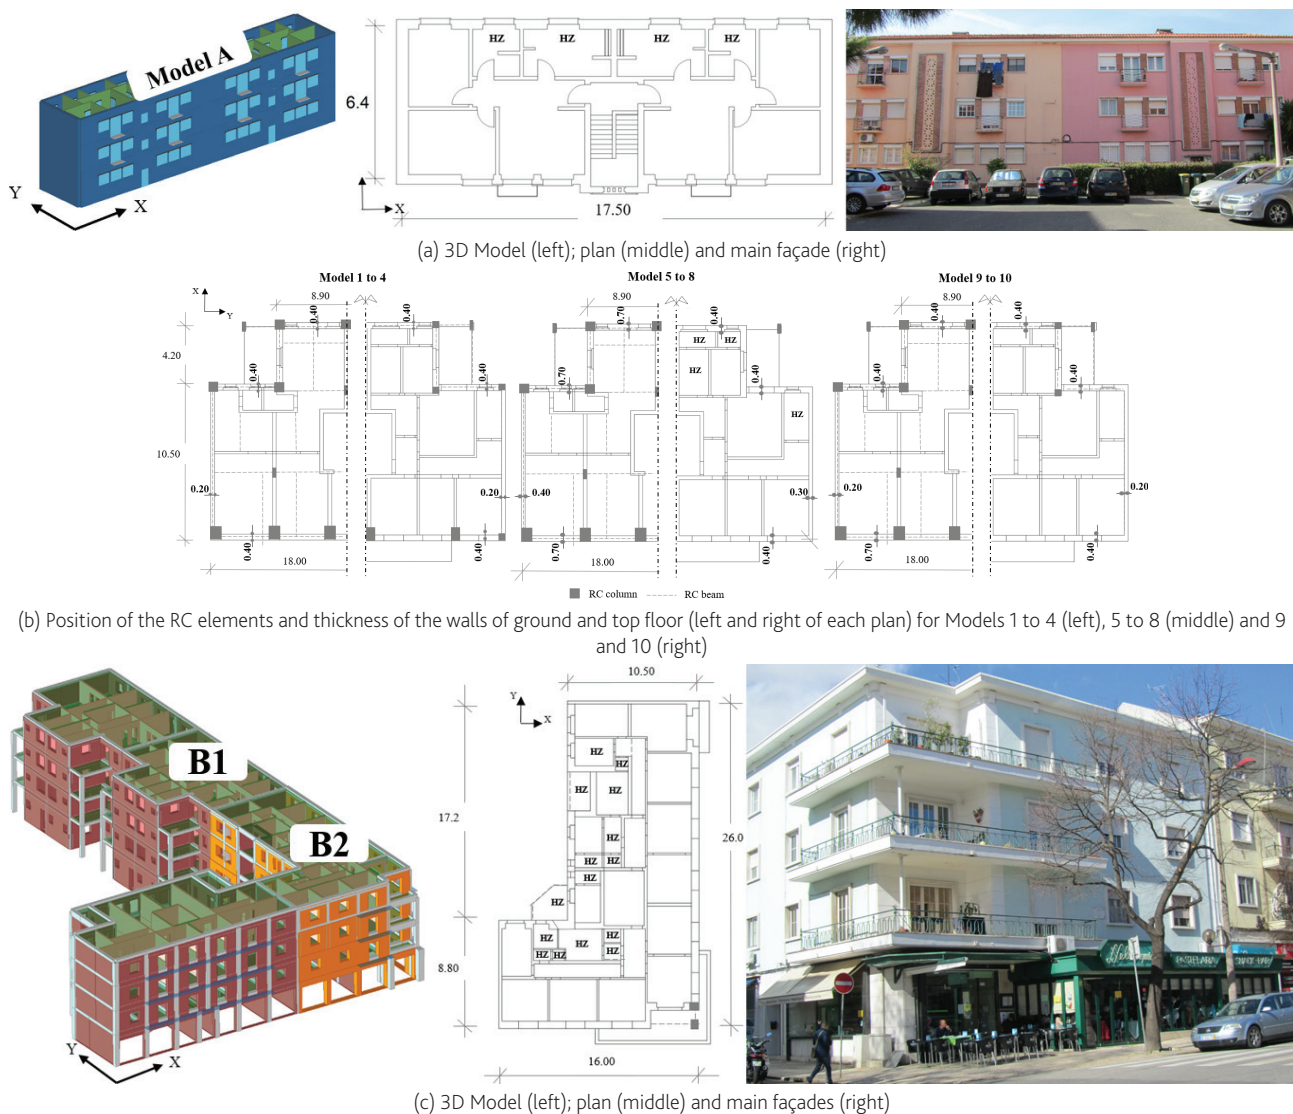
Case studies: (a) “rectangular”; (b) “Rabo de Bacalhau”; (c) “corner” (dimensions in [m])
